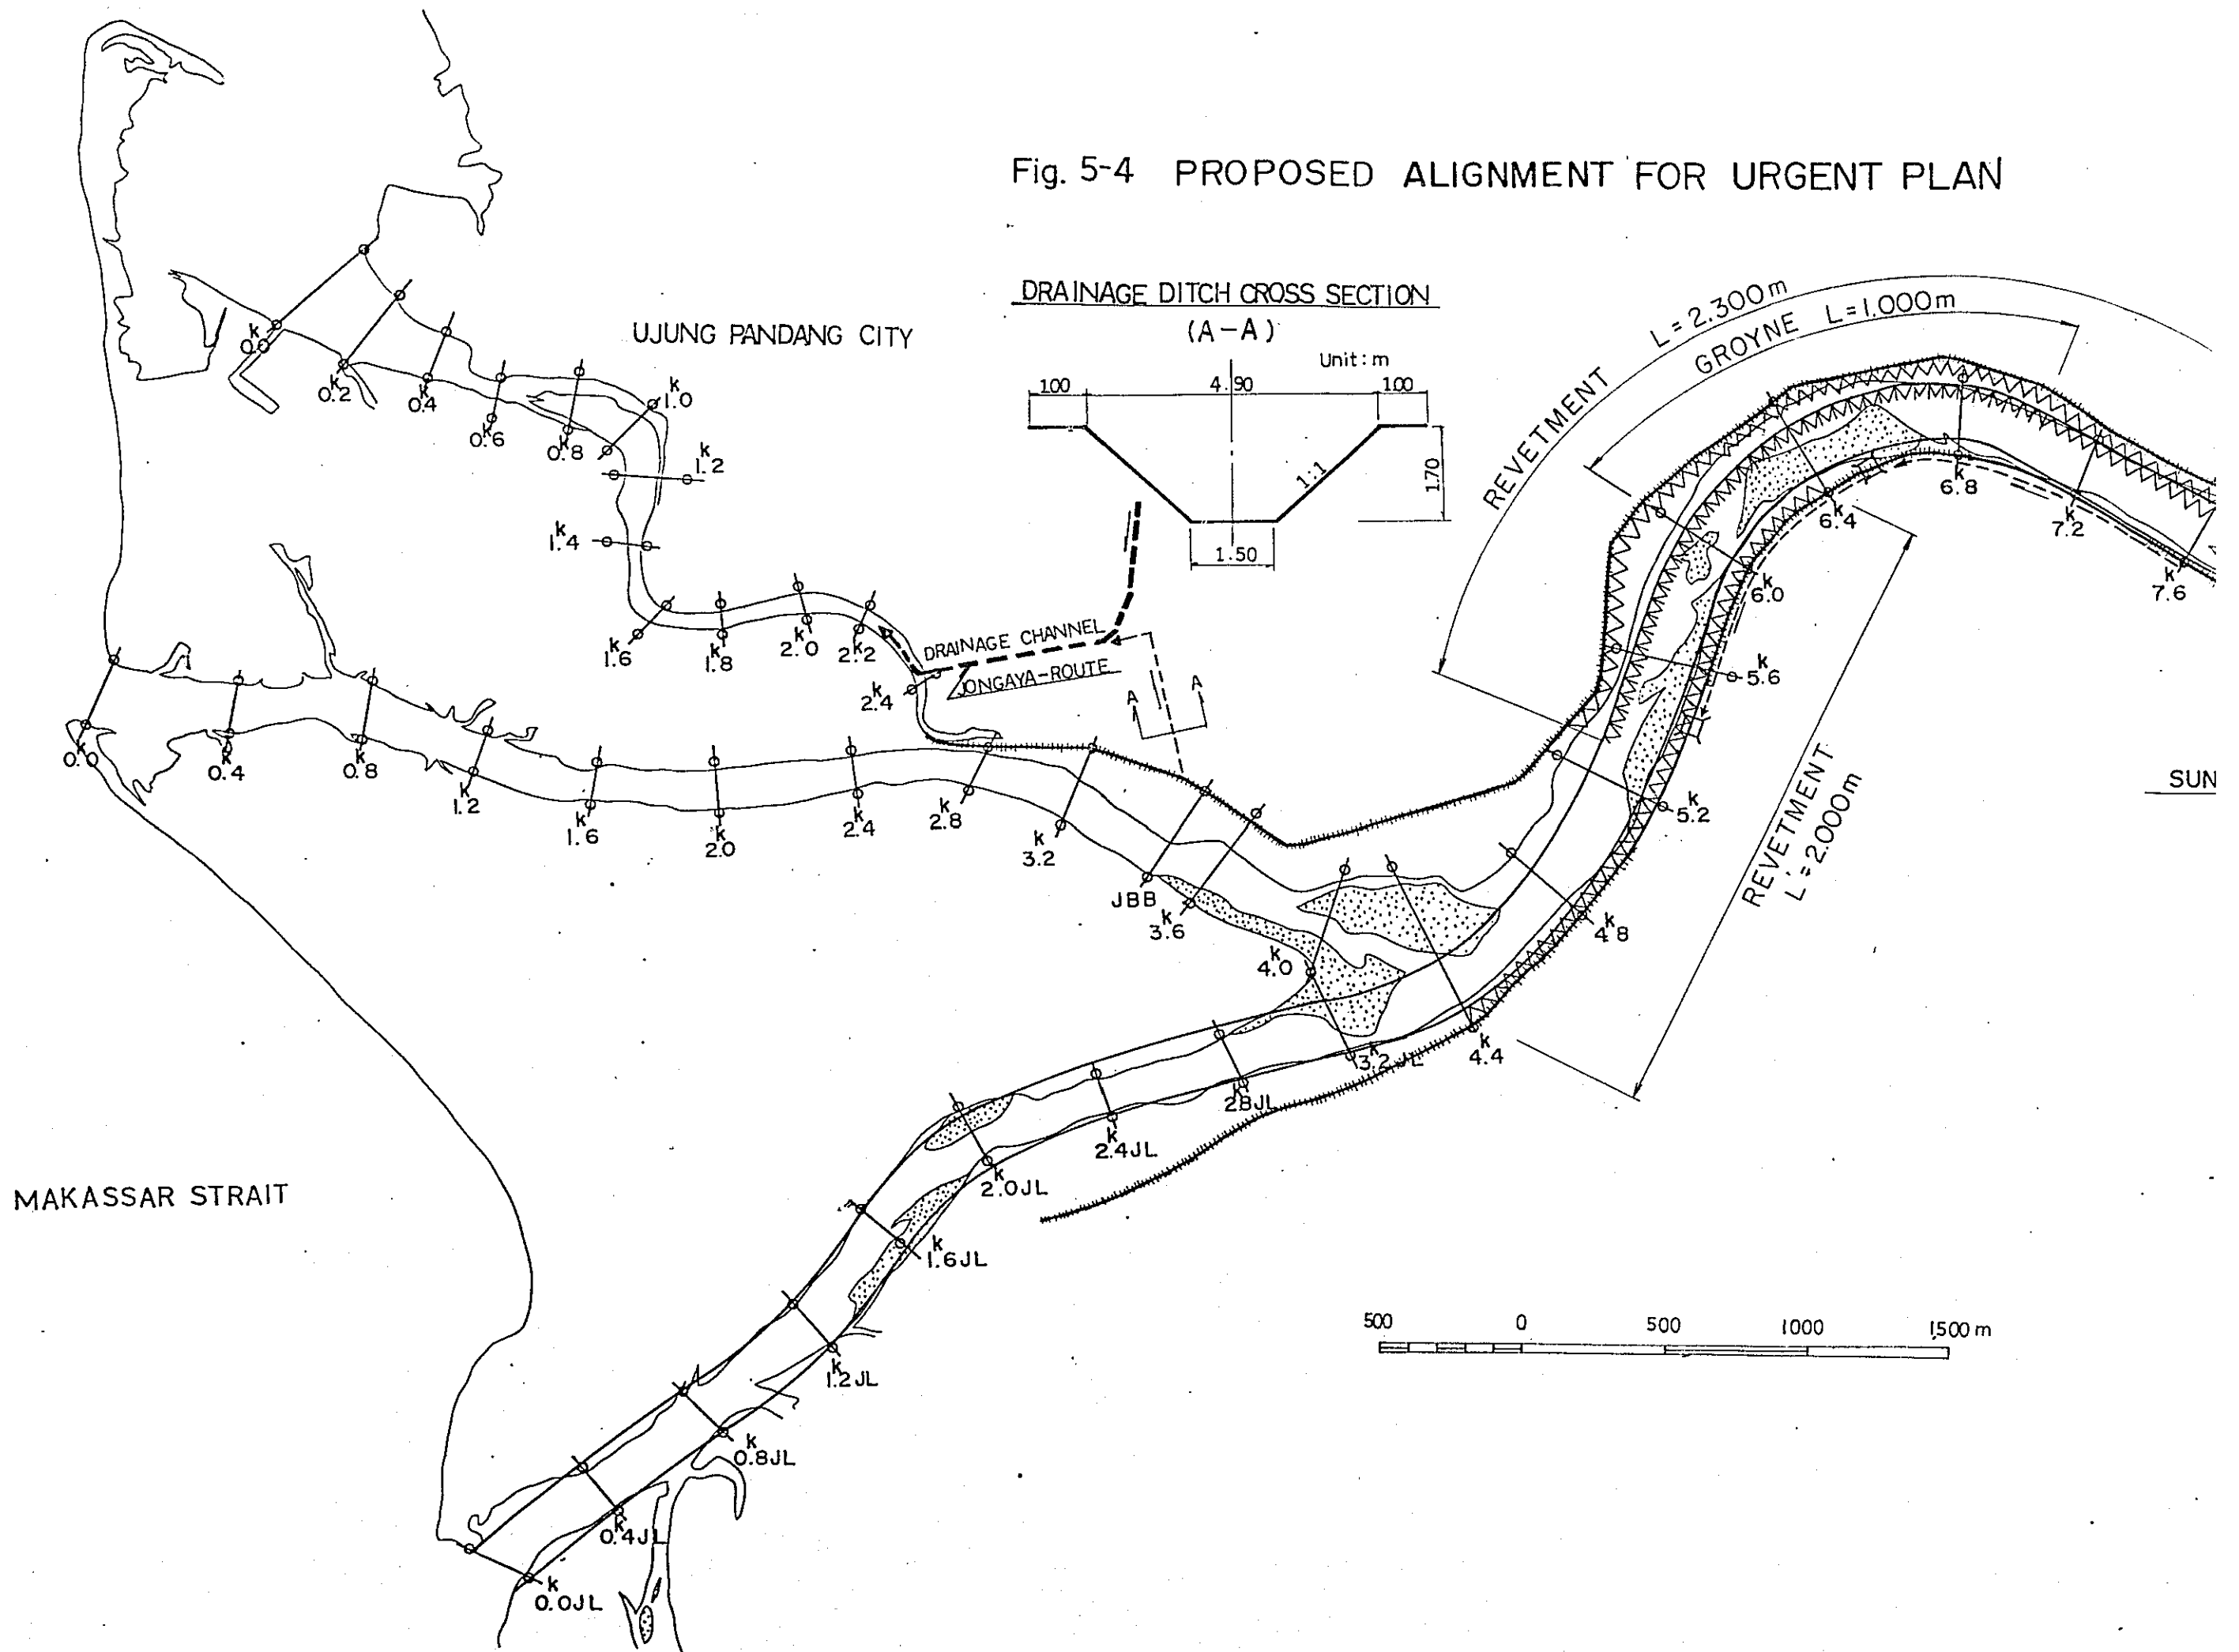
PROPOSED ALIGNMENT FOR URGENT PLAN
